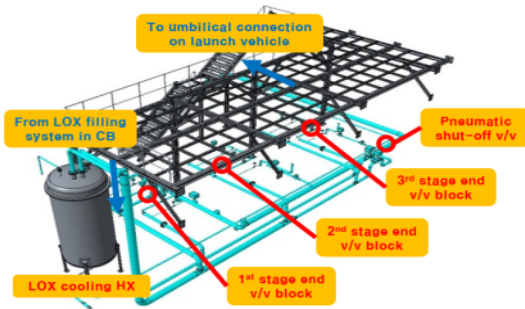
3D Drawing of end valve block of liquid oxygen supply system.
